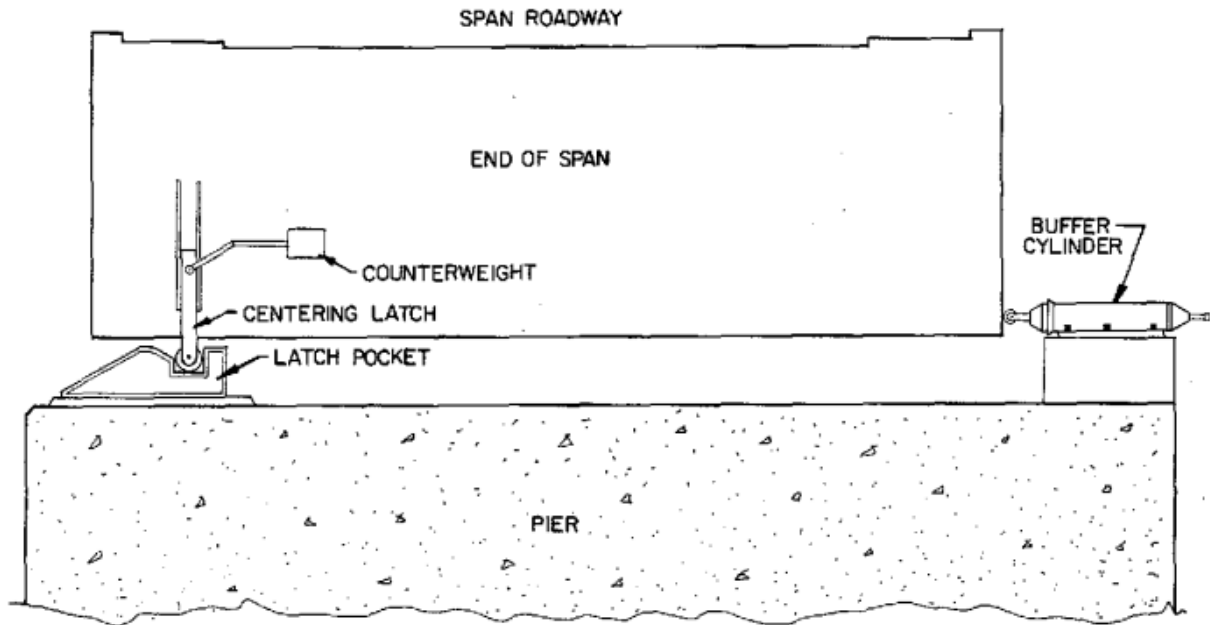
End elevation of span showing location of centering latch and buffer cylinder.
